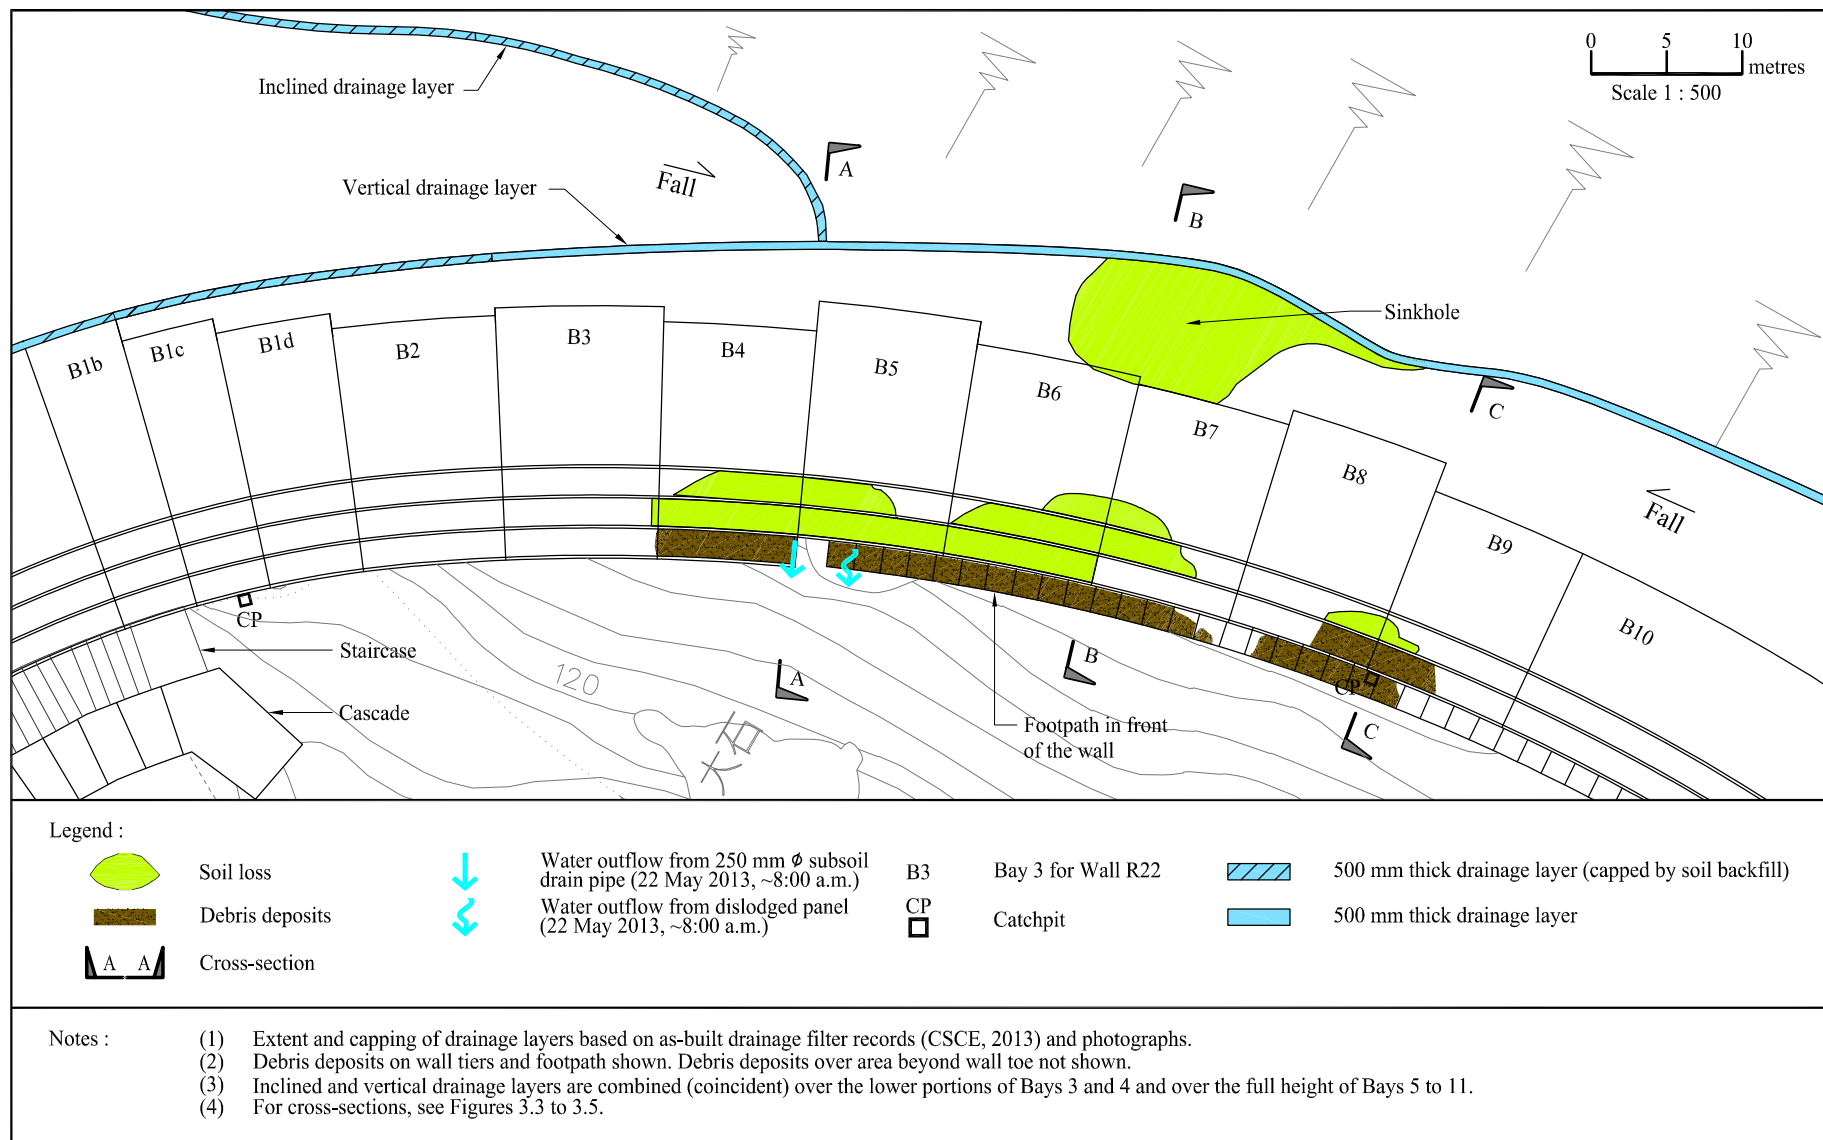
Plan of the 22 May 2013 Incident at Wall R22
